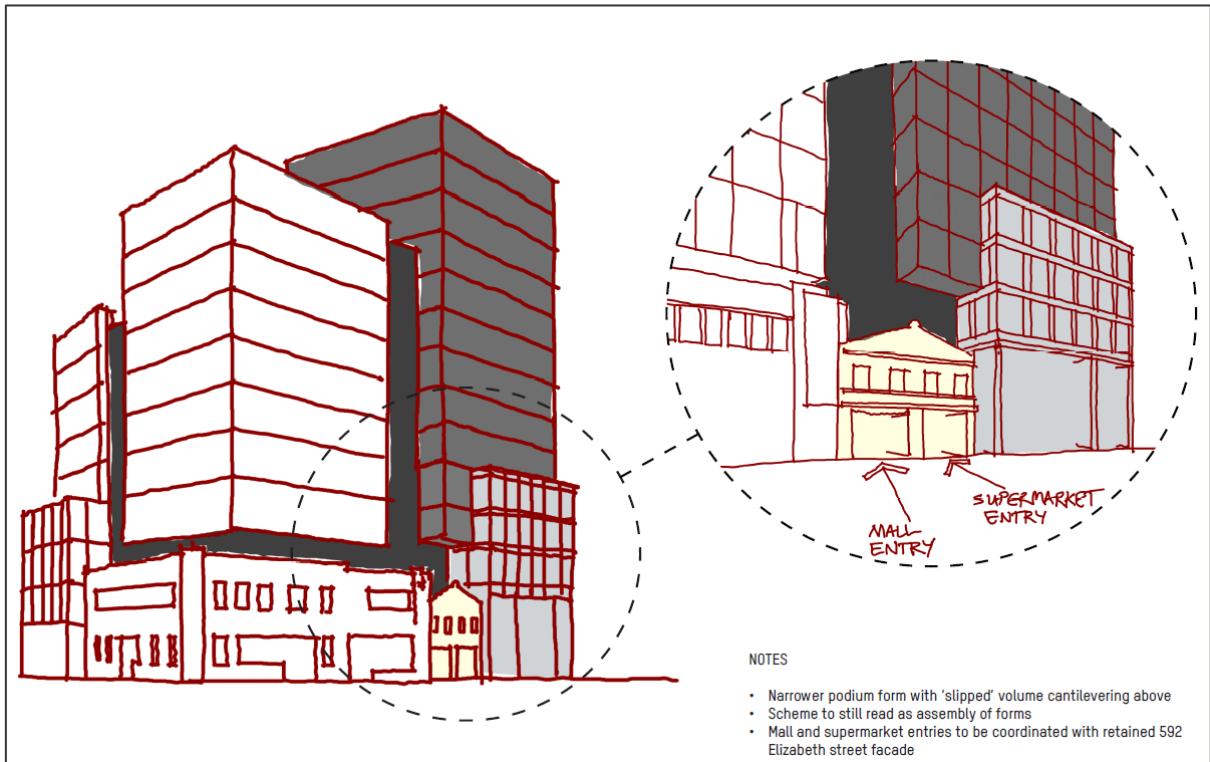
Sketch to show retention of facade of 592 Elizabeth Street (Source: Applicant)
